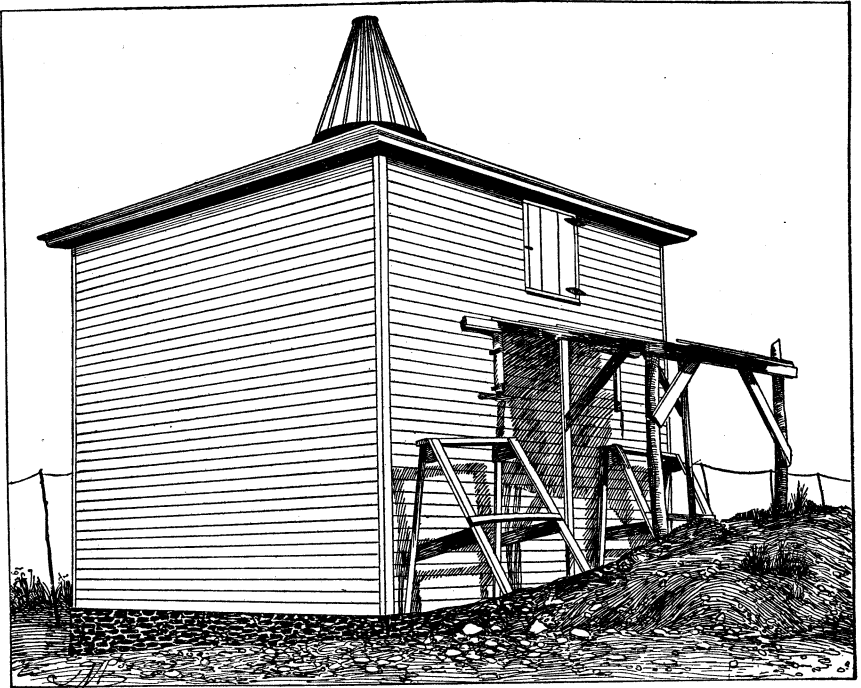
Elevation of building in which the floor construction shown in figure 21 is used.
